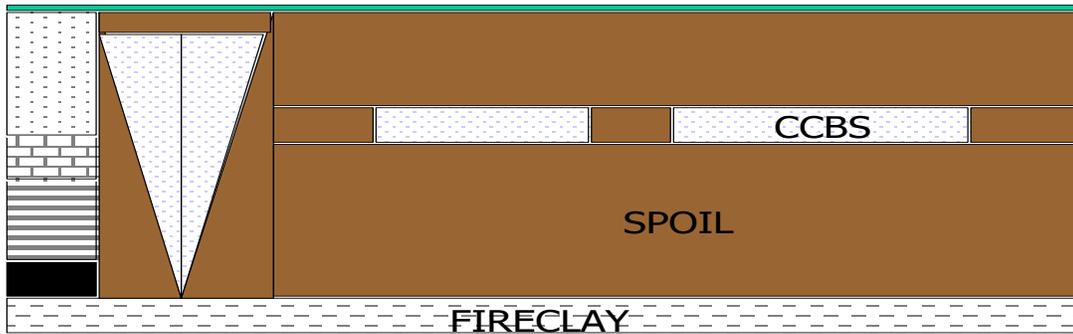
Typical cross-section of CCB placement at a reclaimed coalmine site.
